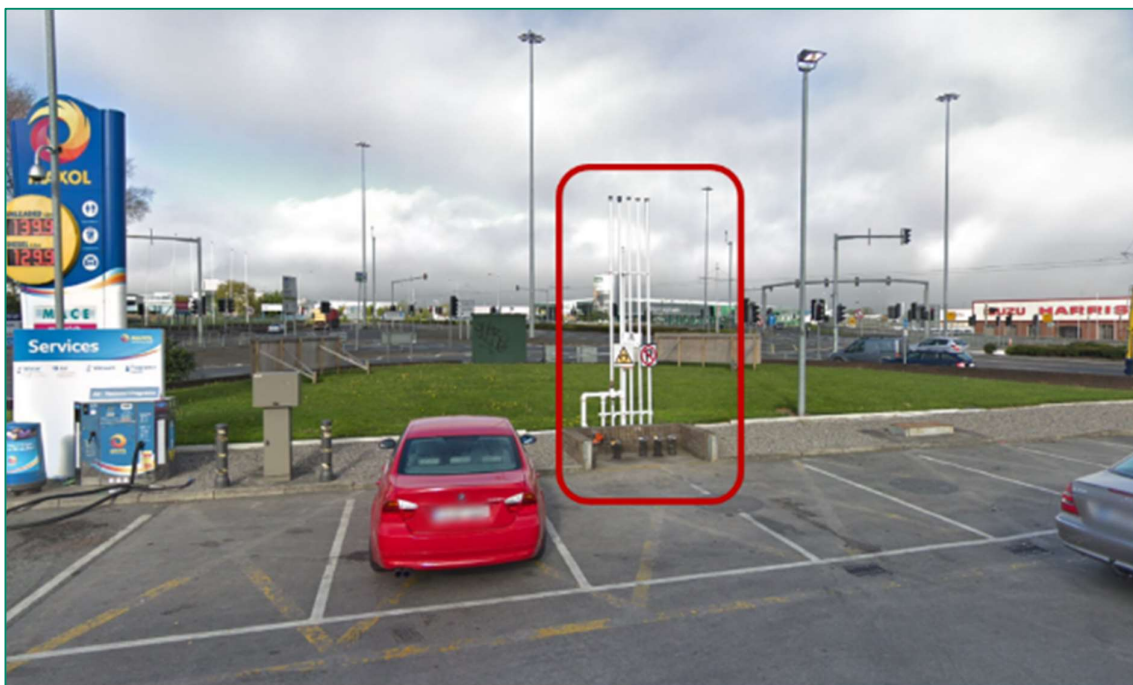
Existing Petro Filling Station Vent Stack facilities (Image Source: Google)
